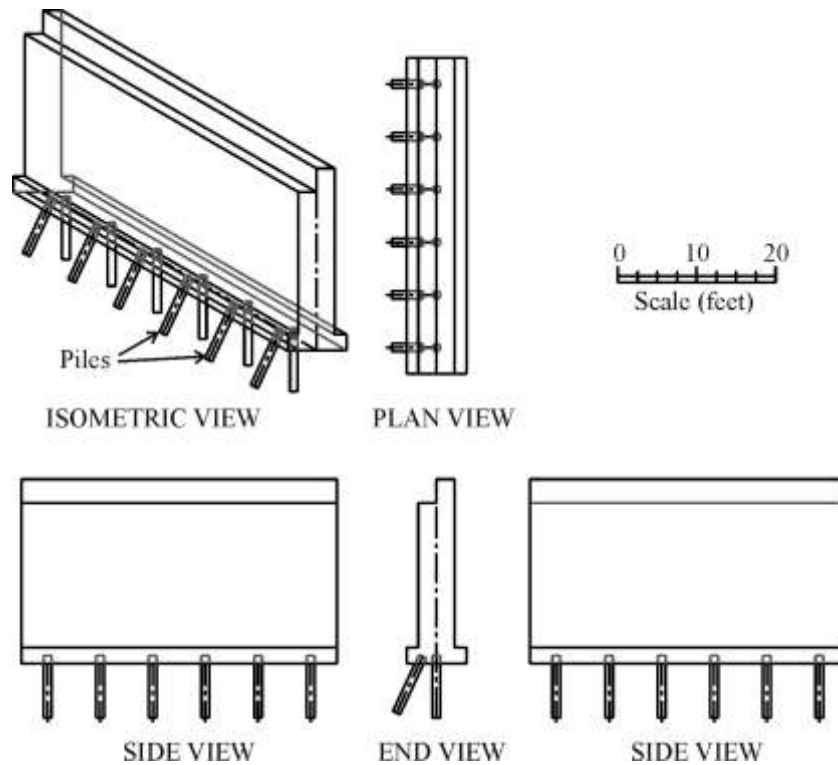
The geometry and dimensions of a standard-stub abutment commonly used for spill-through abutments (prototype scale indicated); design provided by the Iowa DOT
